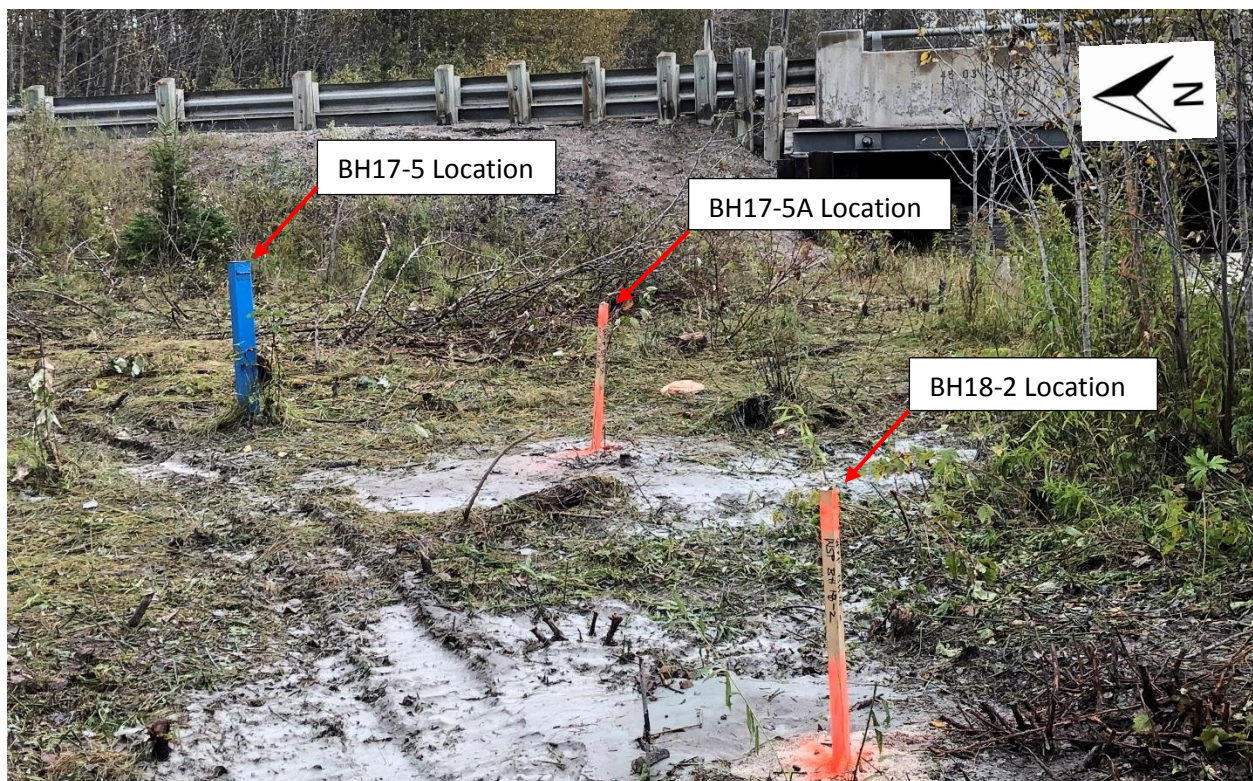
Looking towards South – Rig Access to BH17-5, BH17-6, BH17-5A & BH18-2 (September 2018)
